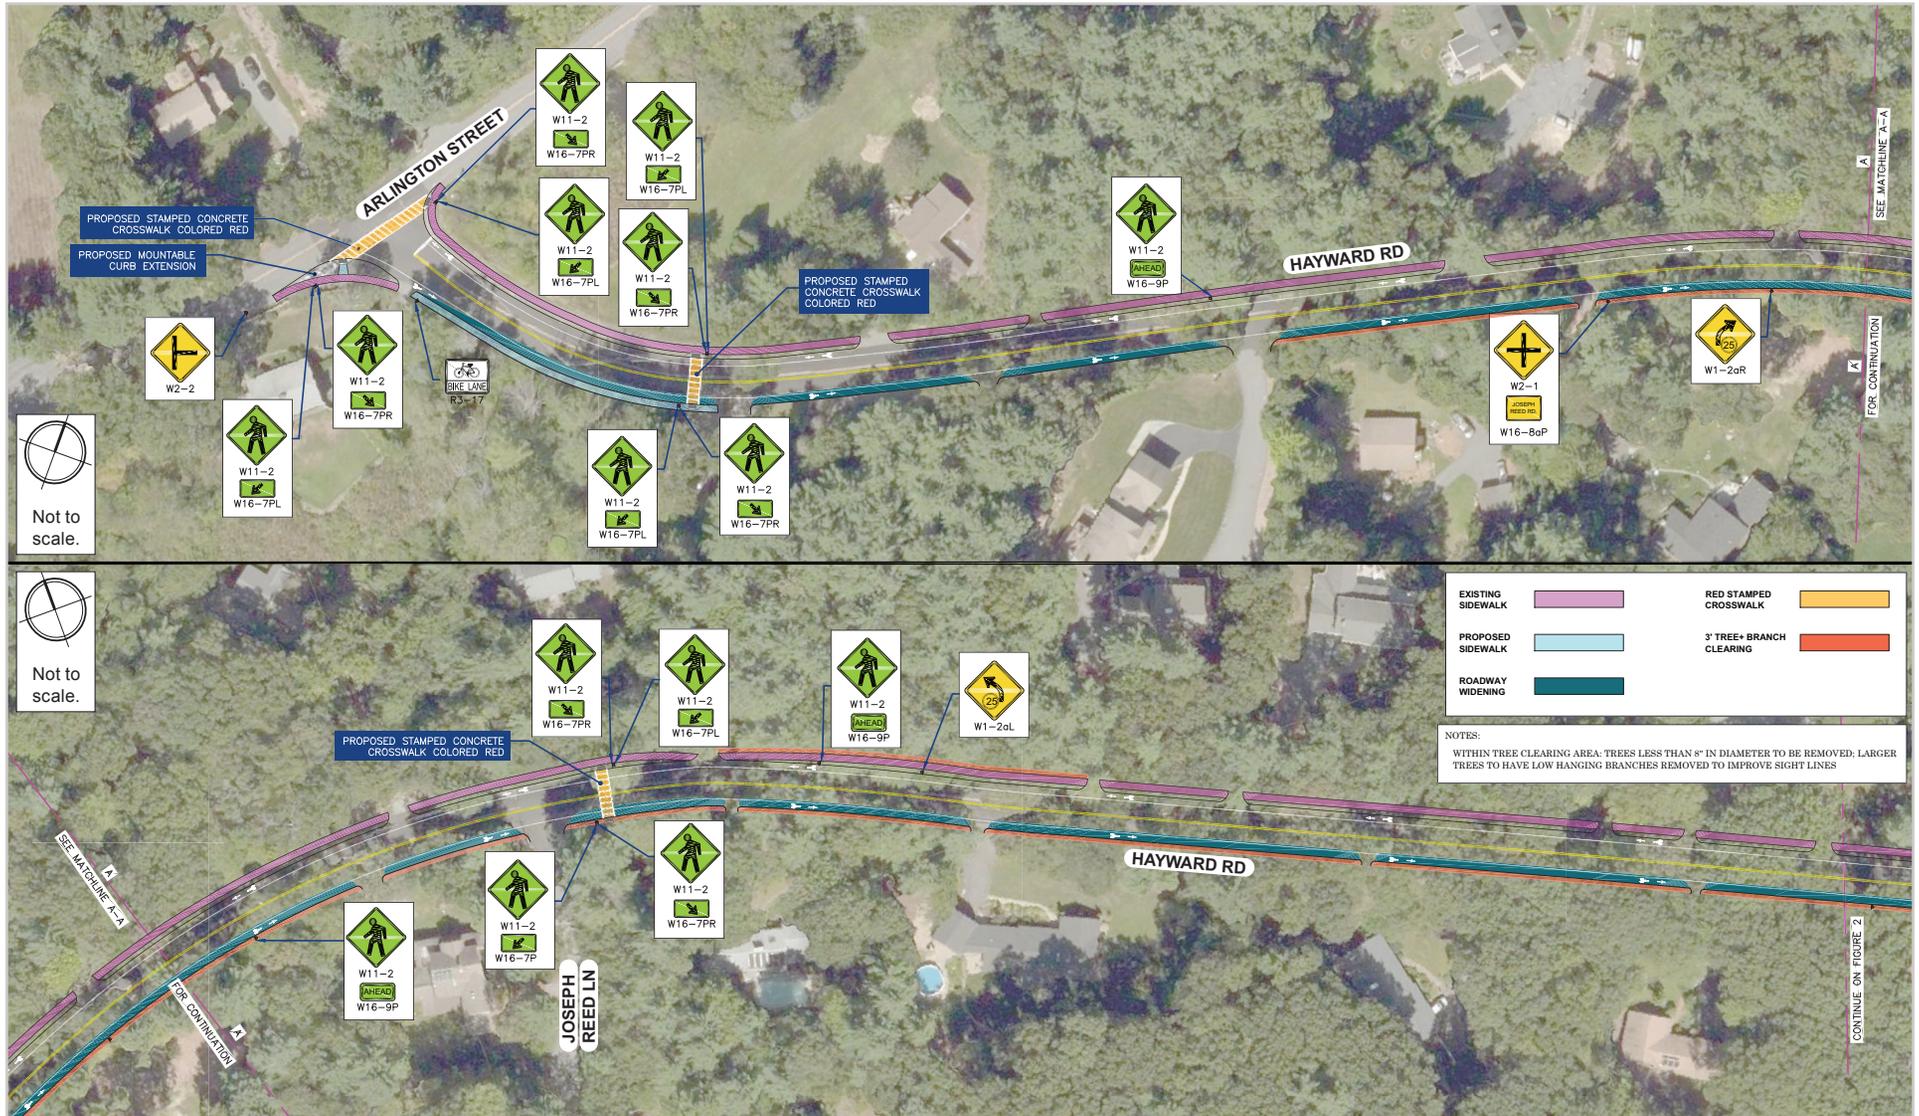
Long-term improvements – 102 Hayward Road to Route 2 Bridge
